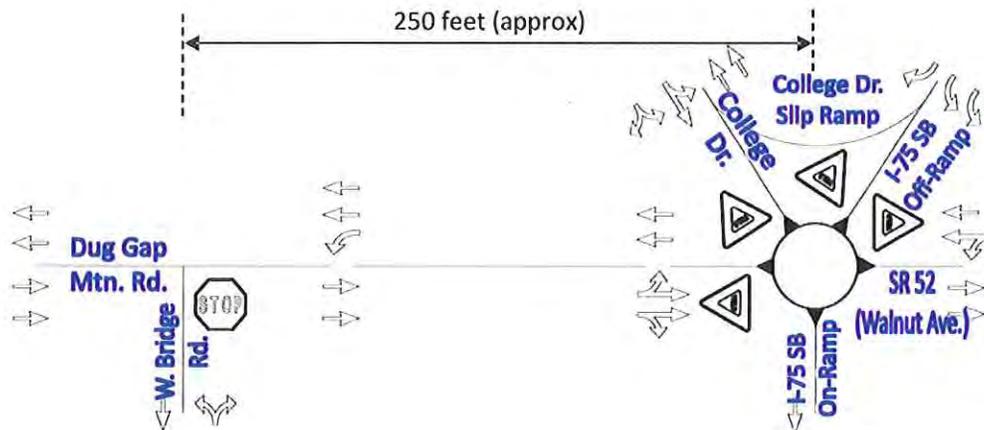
LANE CONFIGURATION FOR BUILD ALTERNATIVE 1 – FOUR LEG ROUNDABOUT AT COLLEGE DRIVE / WEST BRIDGE ROAD/ SR 52
